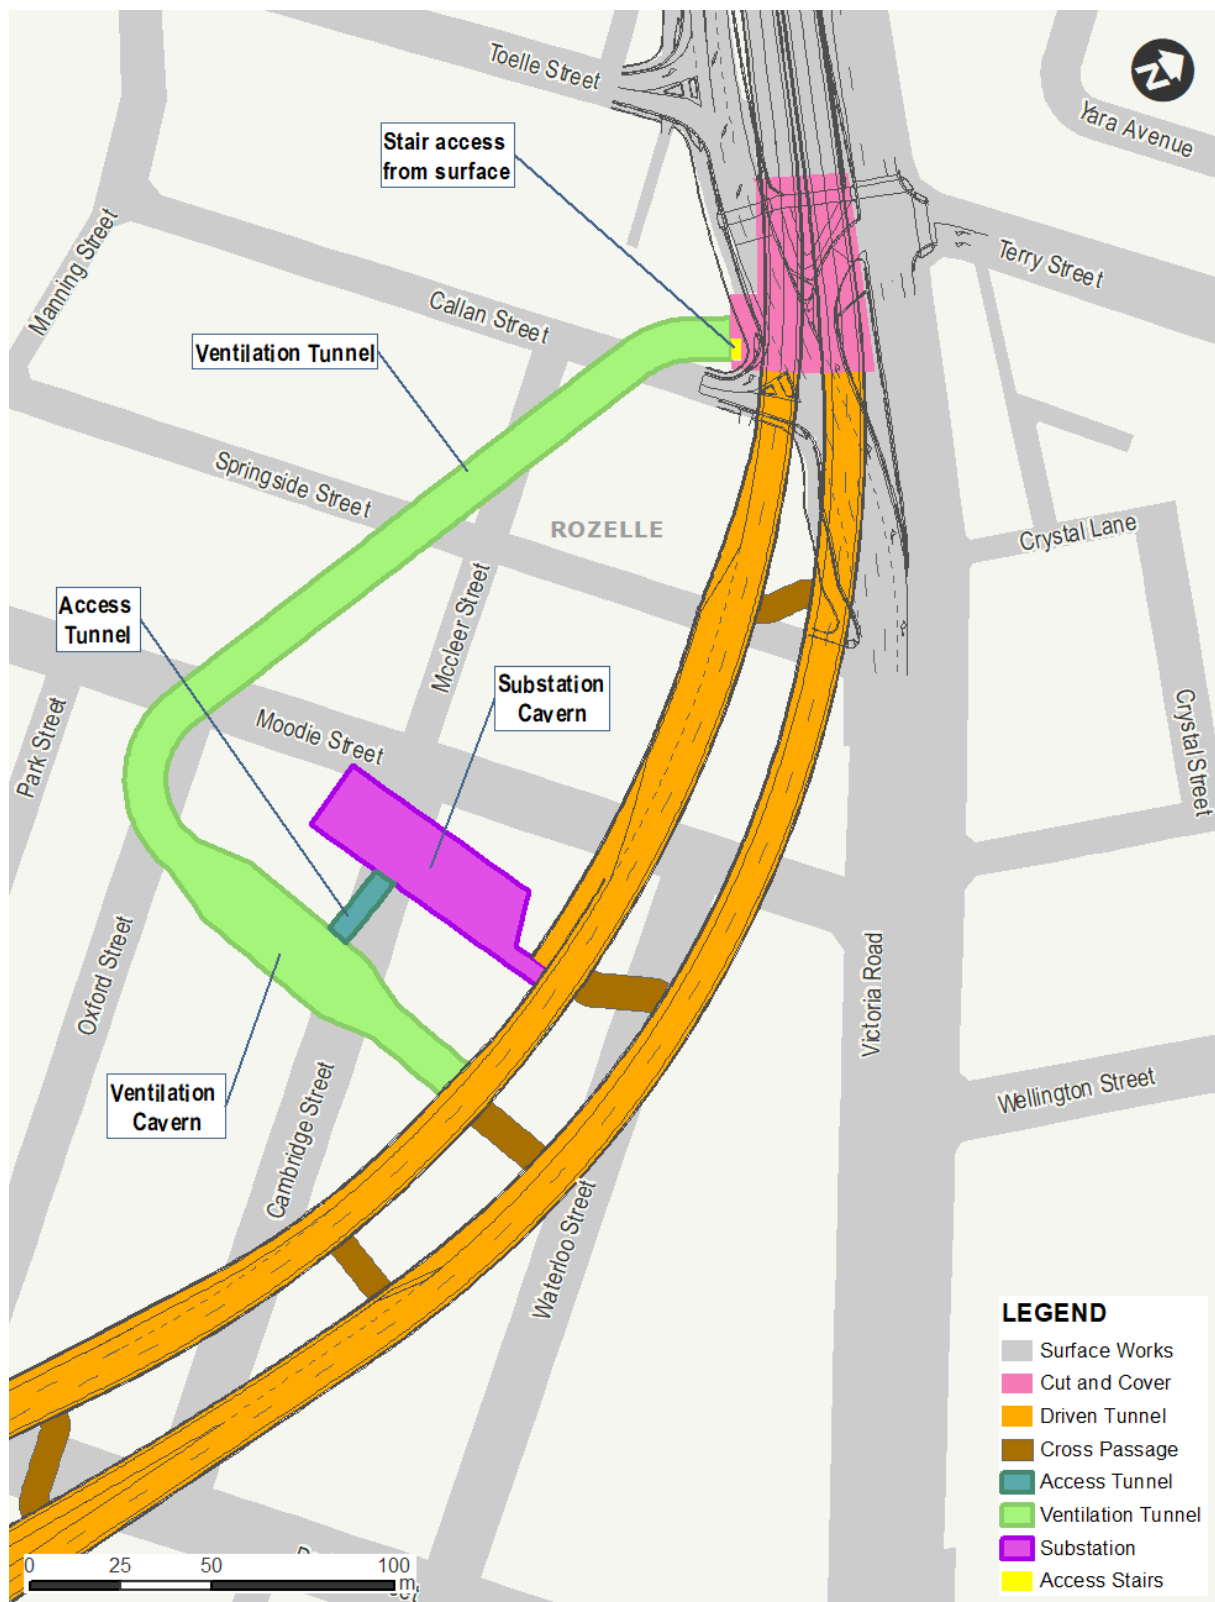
Alignment of proposed new ventilation tunnel and caverns at Iron Cove
